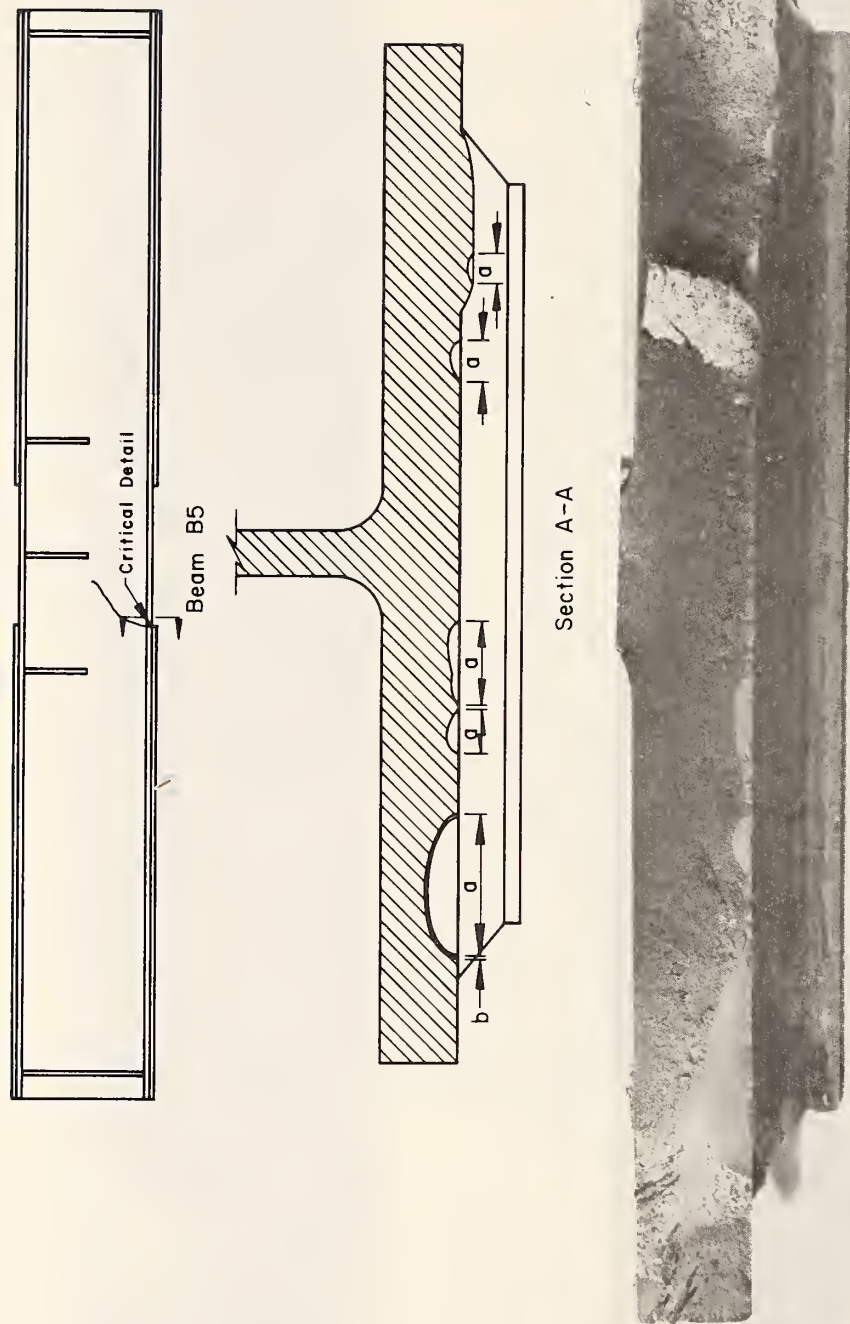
Fatigue and Fracture Surface, B5 (A588, W36X230)
